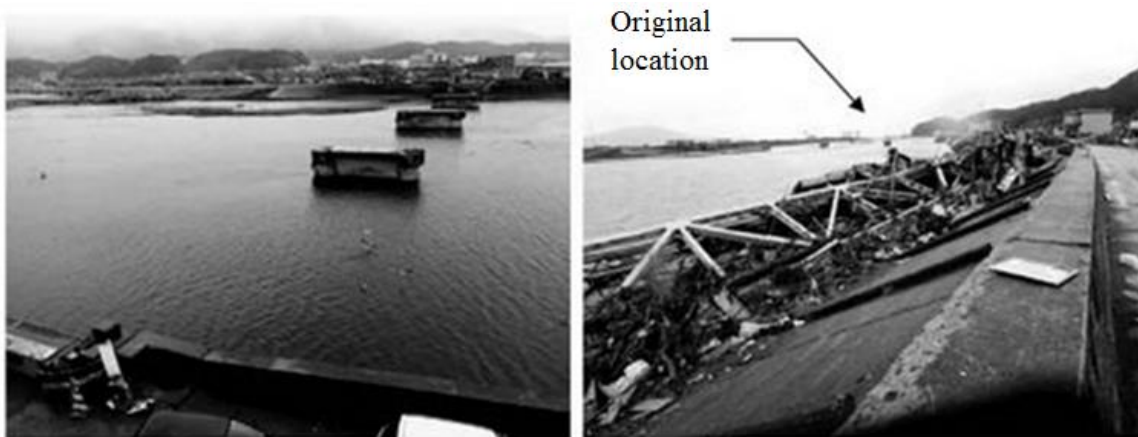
Steel-Truss Road Bridge Swept up to 800m Inland from its Original Location due to the 2011 Great East Japanese Earthquake and Tōhoku Tsunami (2011) (Robertson, with permission from ASCE)
